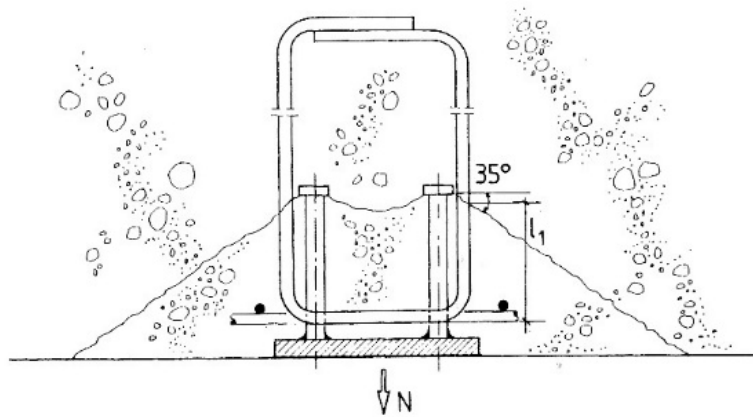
Anchors with hanger reinforcement (stirrups) from [79].
